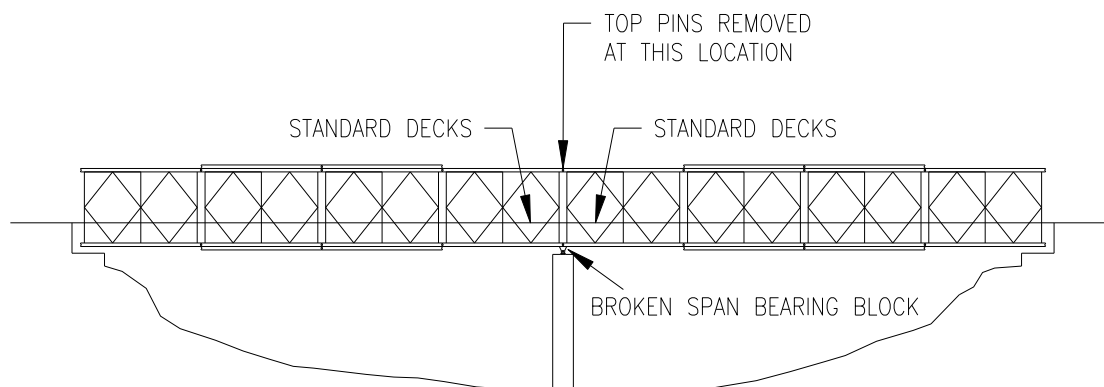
STANDARD BROKEN SPAN CONSTRUCTION
